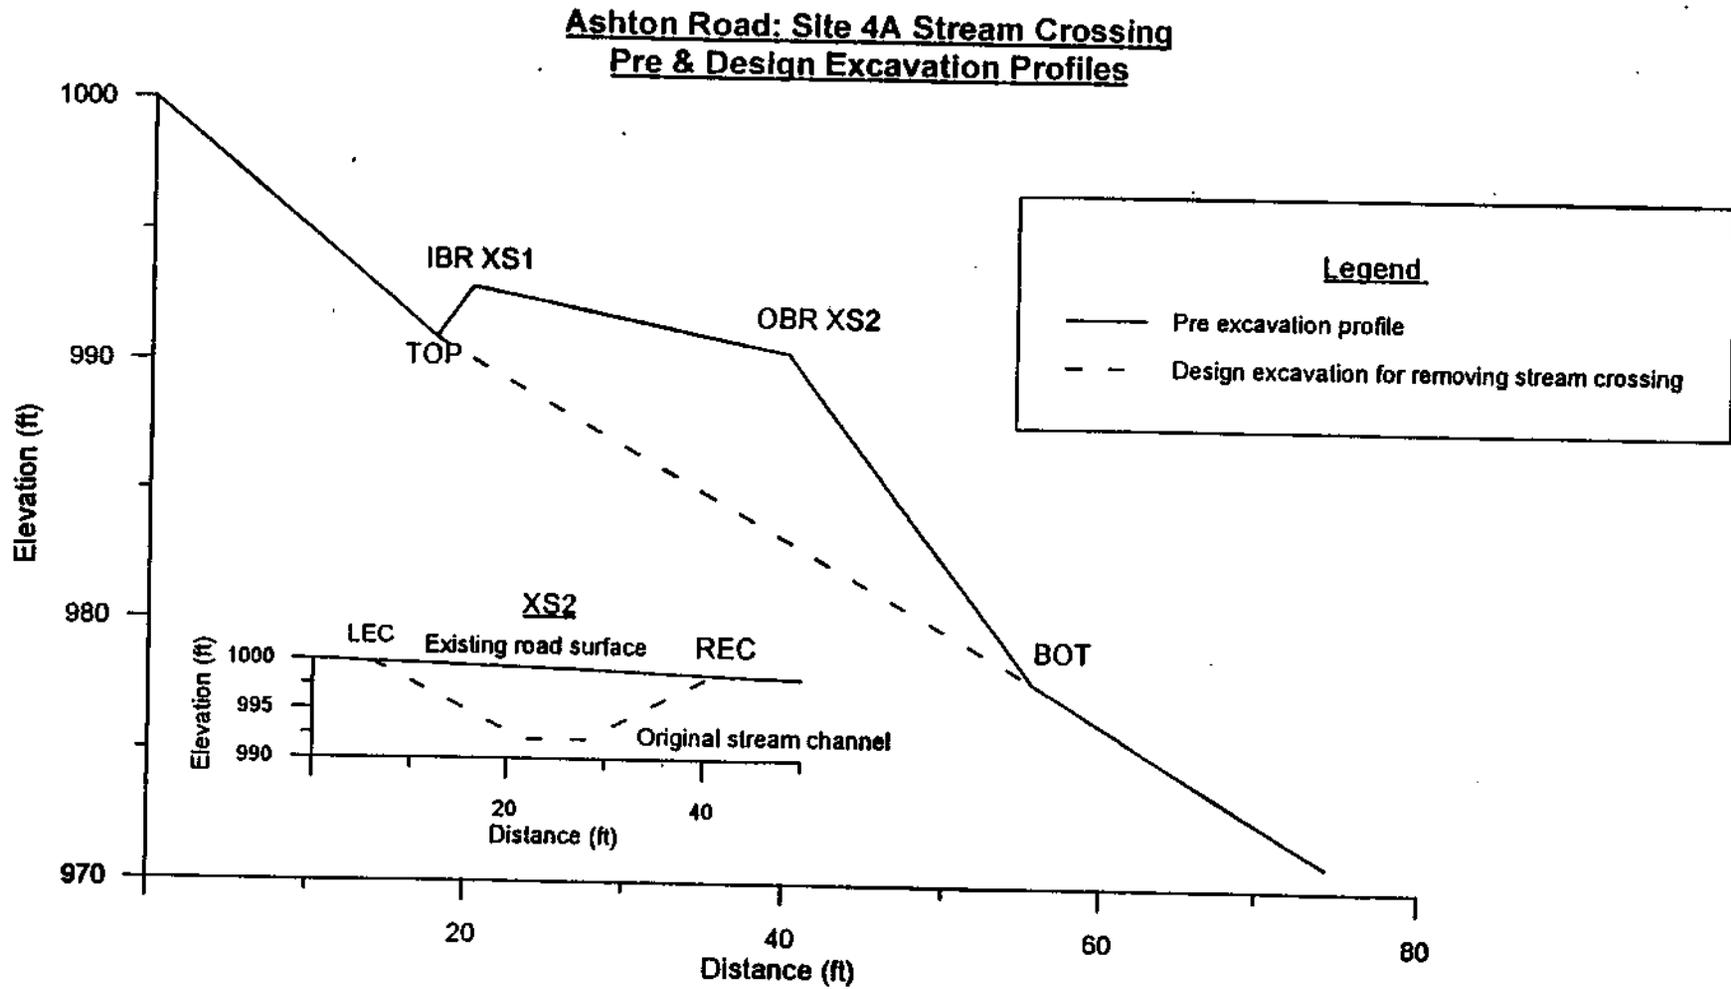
Ashton Road: Site 4A Stream Crossing Pre & Design Excavation Profiles.
